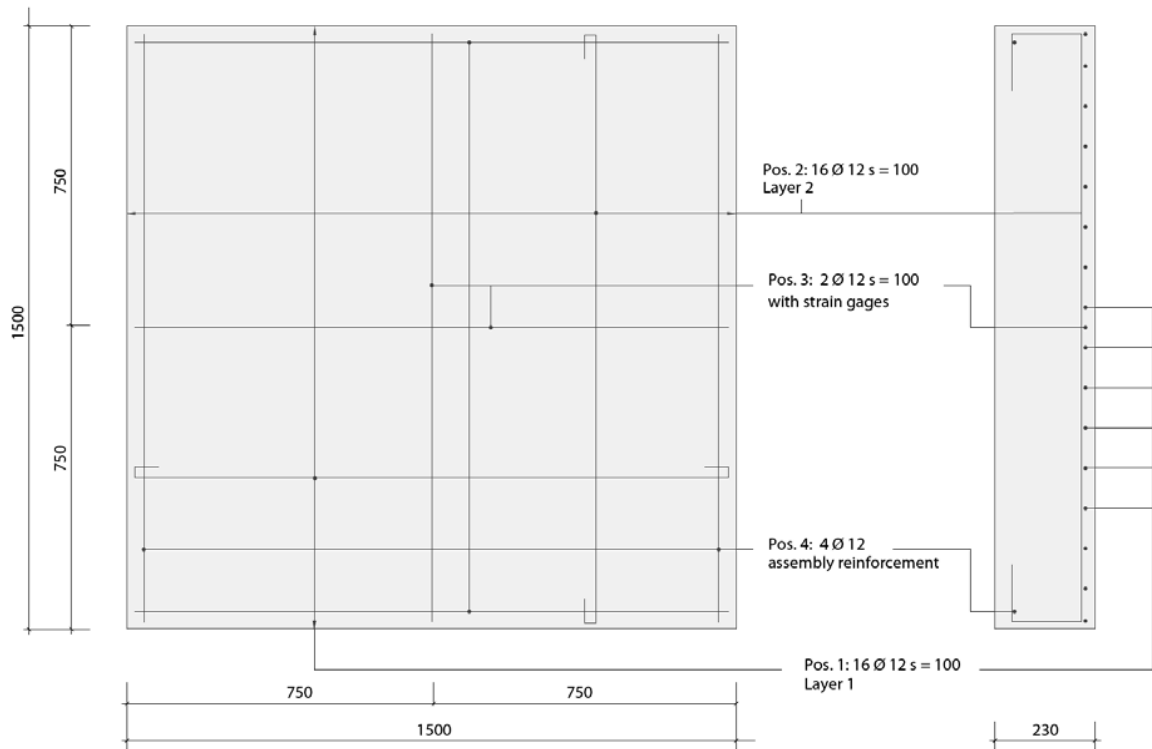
Reinforcement layout of slabs (All dimensions in mm)
